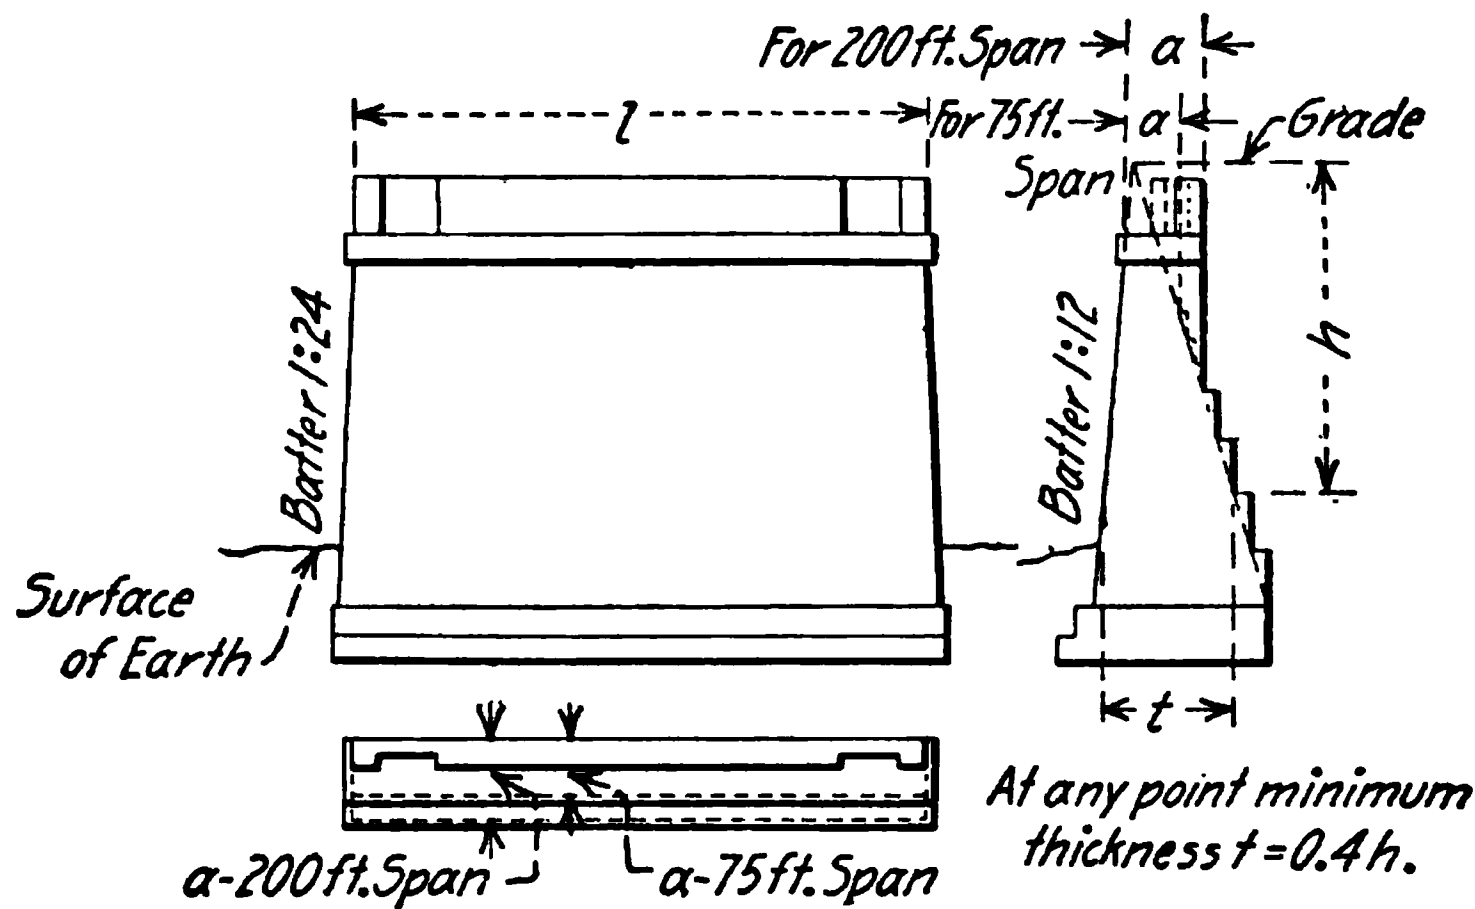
COOPER'S STANDARD MASONRY ABUTMENTS WITHOUT WING WALLS FOR HIGHWAY BRIDGES.
